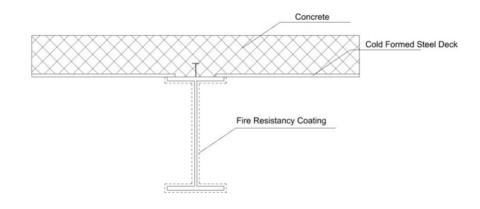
THE COMMON CONSTRUCTION DETAIL OF CONCRETE AND STEEL BEAM WITH COLD FORM STEEL DECK AS THE FORMWORK OF THE CONCRETE AND NECESSITY OF HAVING A FIRE-RESISTANT COATING FOR THE STEEL. ©ZHAW
